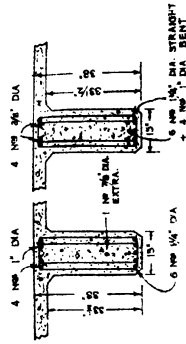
DETAILS OF BEAMS, ISMAL COLLEGE AT ANDHERI.
